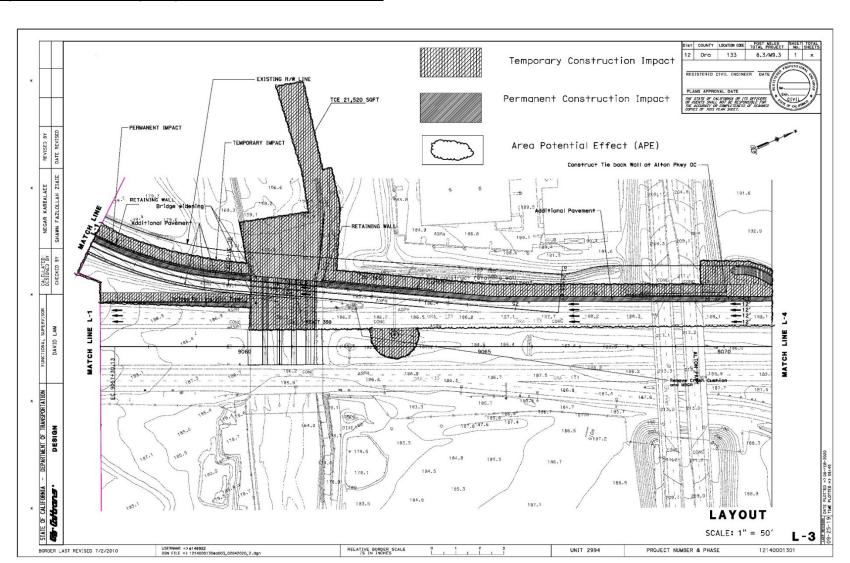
Preliminary Project Plan Sheets (Sheet 3 of 5)
